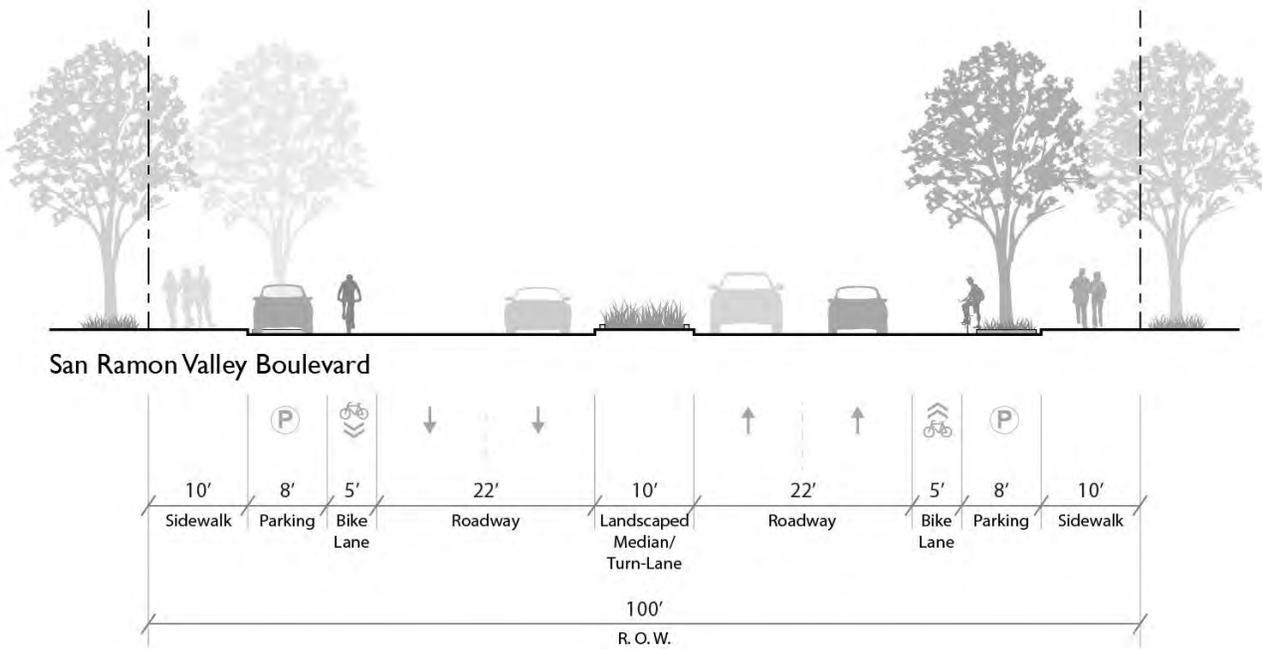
STREET CROSS-SECTION: SAN RAMON VALLEY BOULEVARD
